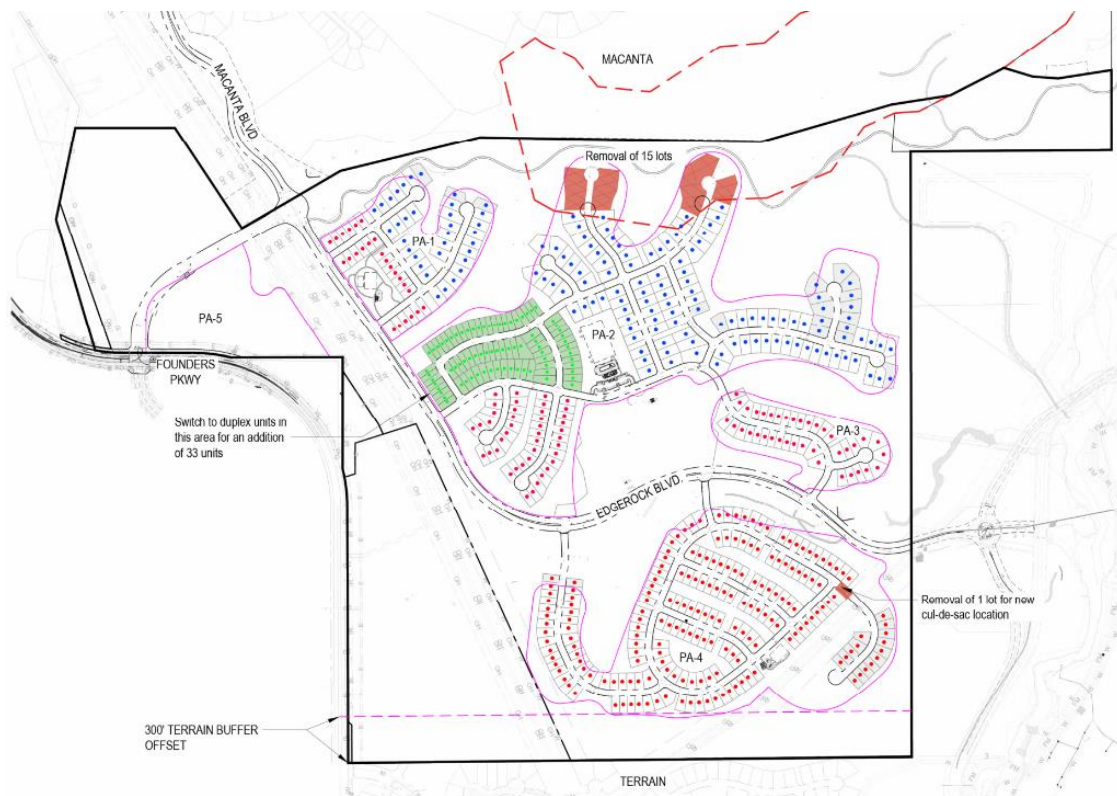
Site Plan (Shaded Red Lots Removed from Original Design)
